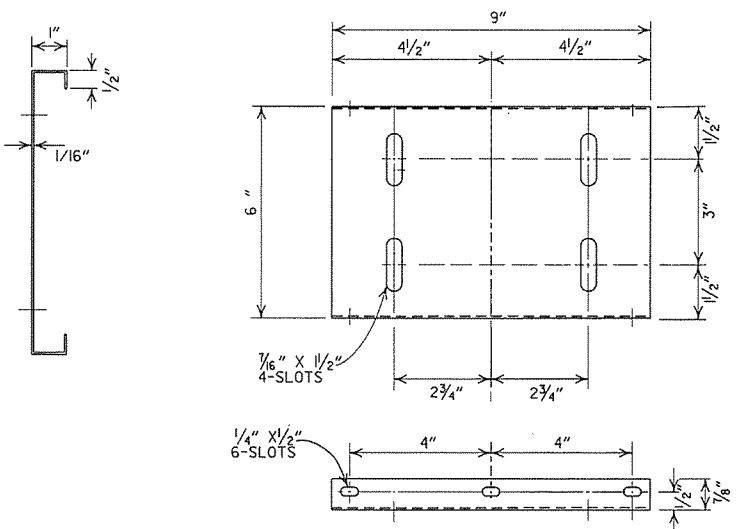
DETAIL OF TERMINAL ANCHOR POST (TYPE I)
